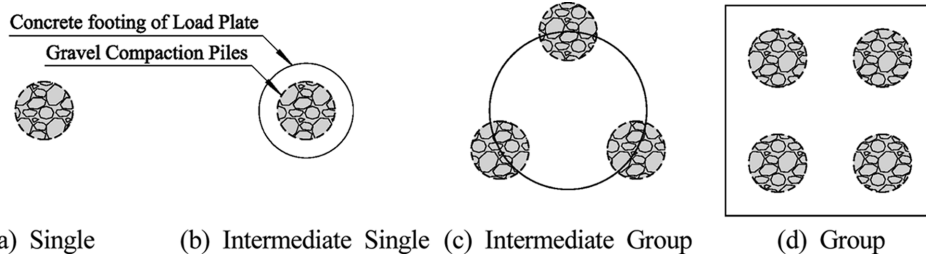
Typical static load test setup for gravel compaction piles (Stuedlein, 2008).
